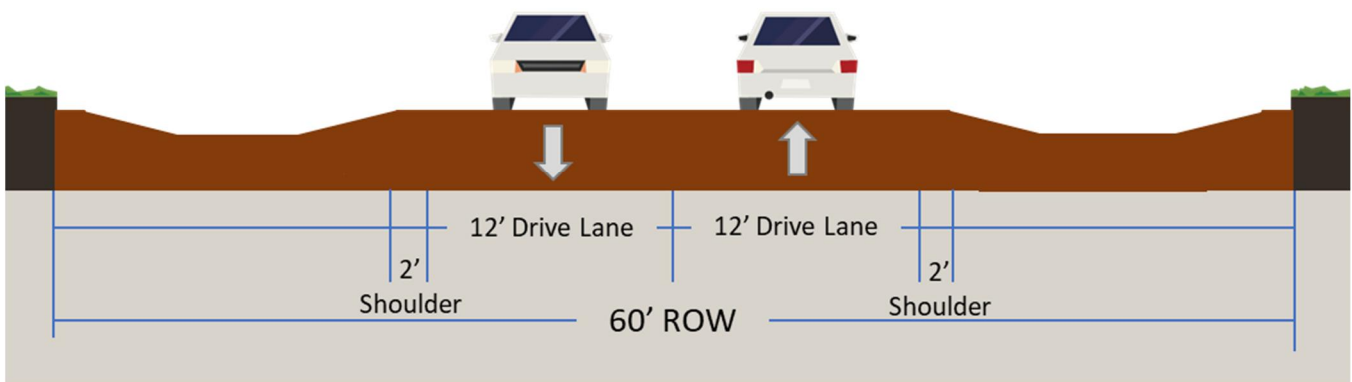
Proposed Cross Section: Rural Road (assuming an open bar ditch)
